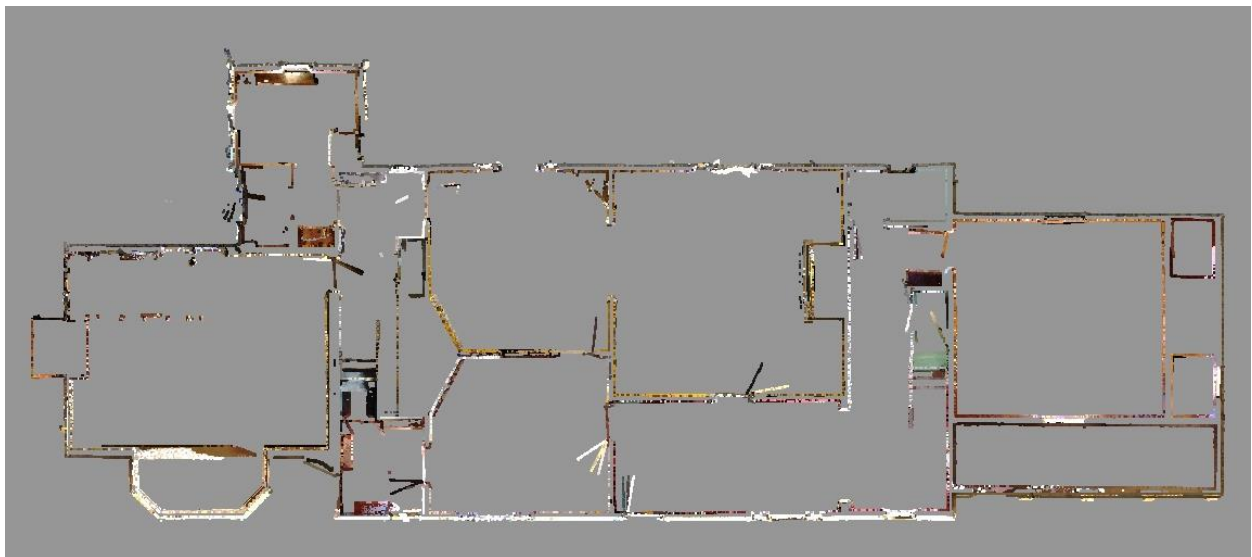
The first-floor plan of Sylvania, with north facing up, generated by 3D data. There is no central passage present in the current plan.
